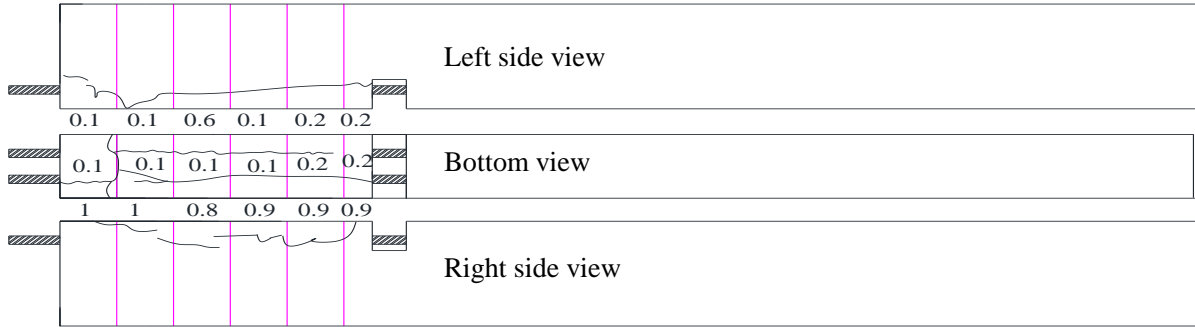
Schematic drawing of the corrosion cracks for Beam M-350-R-h. The corrosion crack widths are measured in mm.
